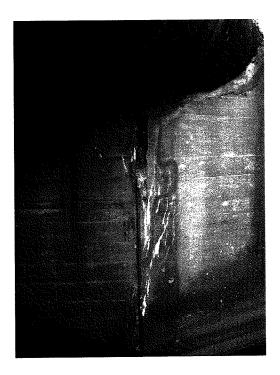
Vertical Crack and Delaminations on West Abutment
